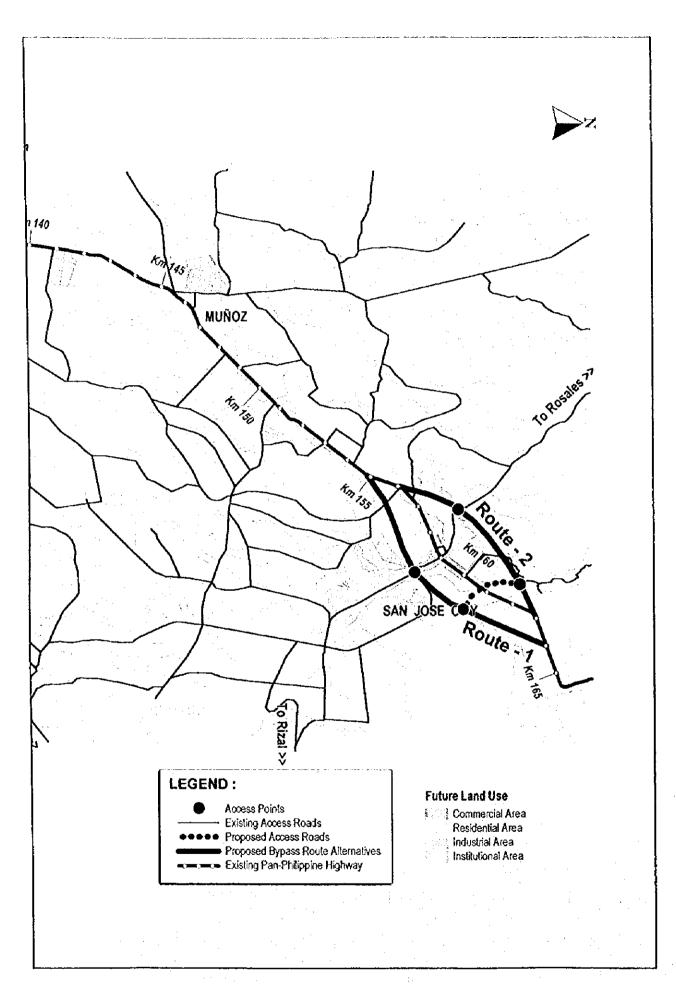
PROPOSED ACCESS ROADS SAN JOSE BYPASS
